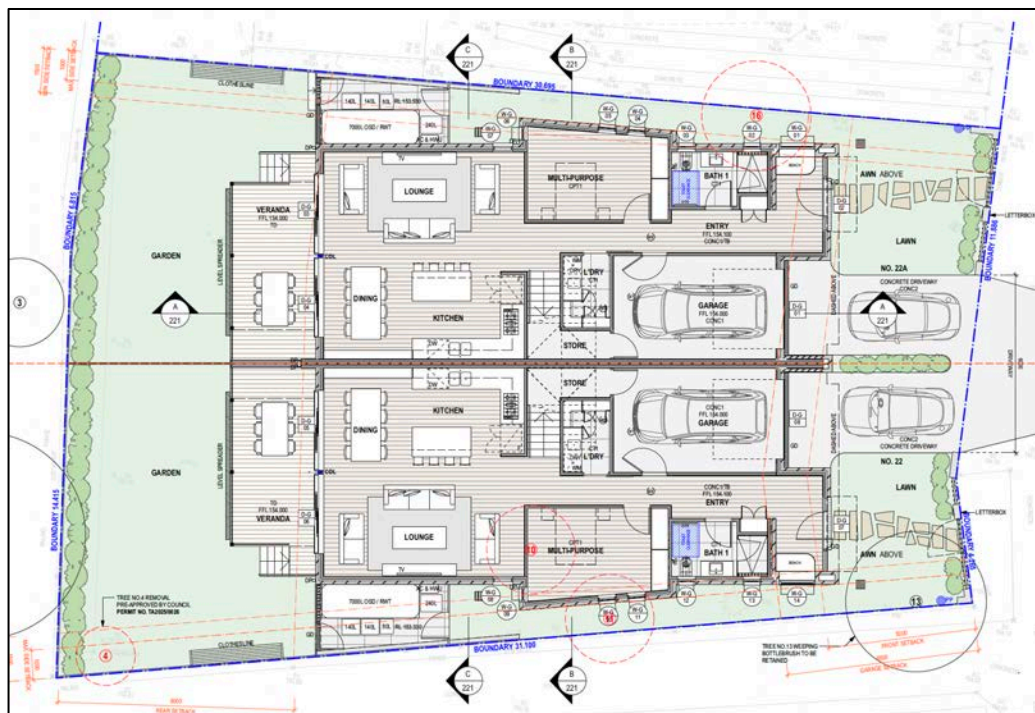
The proposed ground floor plans. (Source Proposed Ground Floor Plan, by MHP Architects, Rev A, dated 11/03/2025).
